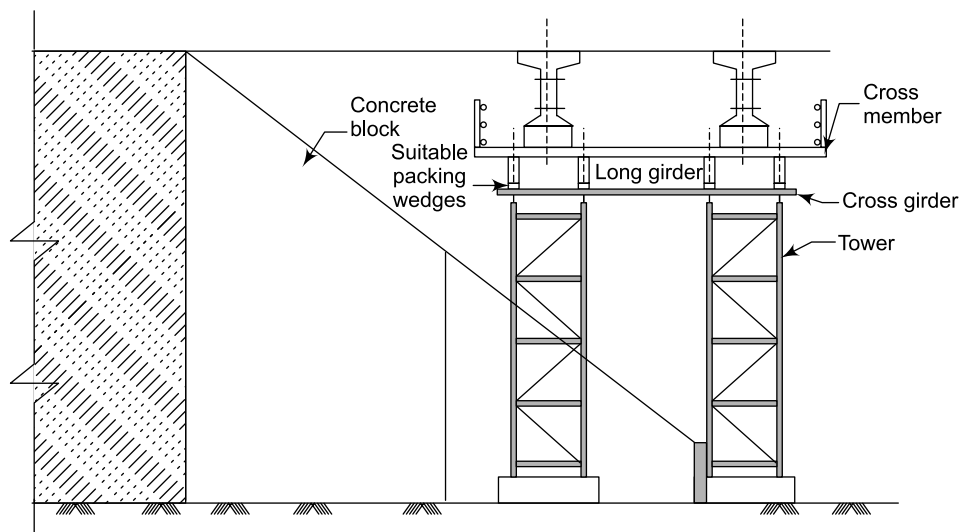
Another View of Trestles Arrangement for Supporting Girder and Slab for ROB.
